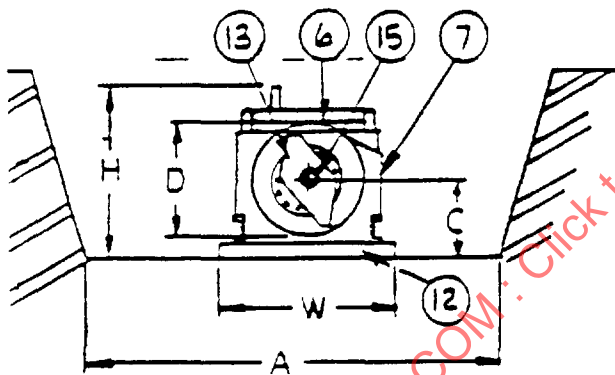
TRACK-TYPE AUGER BORING MACHINE
